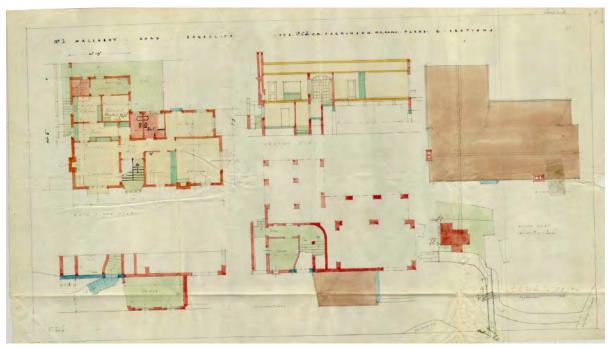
Architectural plans from BA174/1941 (Woollahra Records)
